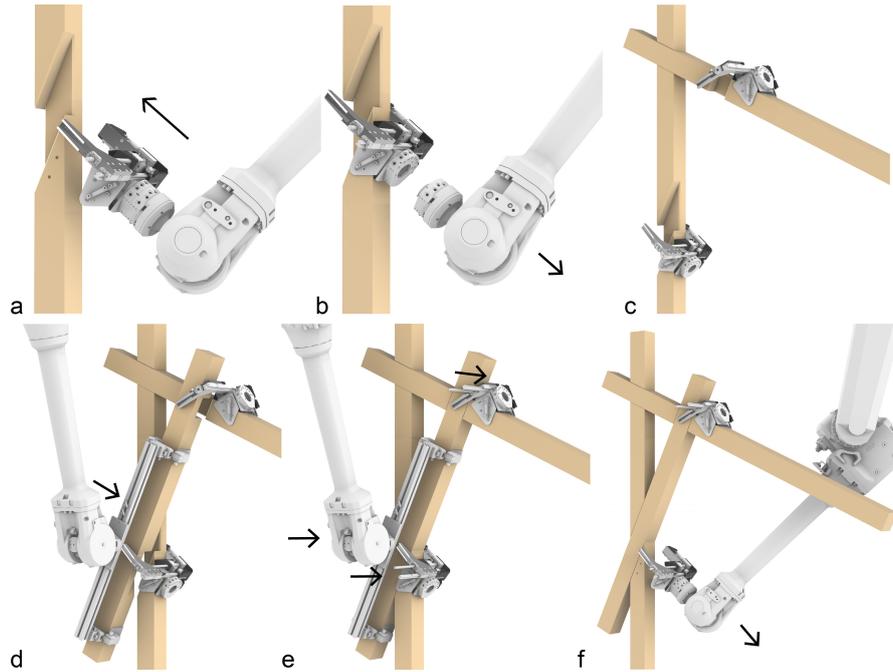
Robotic arm moving clamp to joint. (b) Clamp detach from arm. (c) As many clamps as necessary are placed. (d) Robotic arm brings a new element in the clamp jaw using a gripper. (e) Element assembled by arm and clamps. (f) Clamps removed by robot, one at a time.
